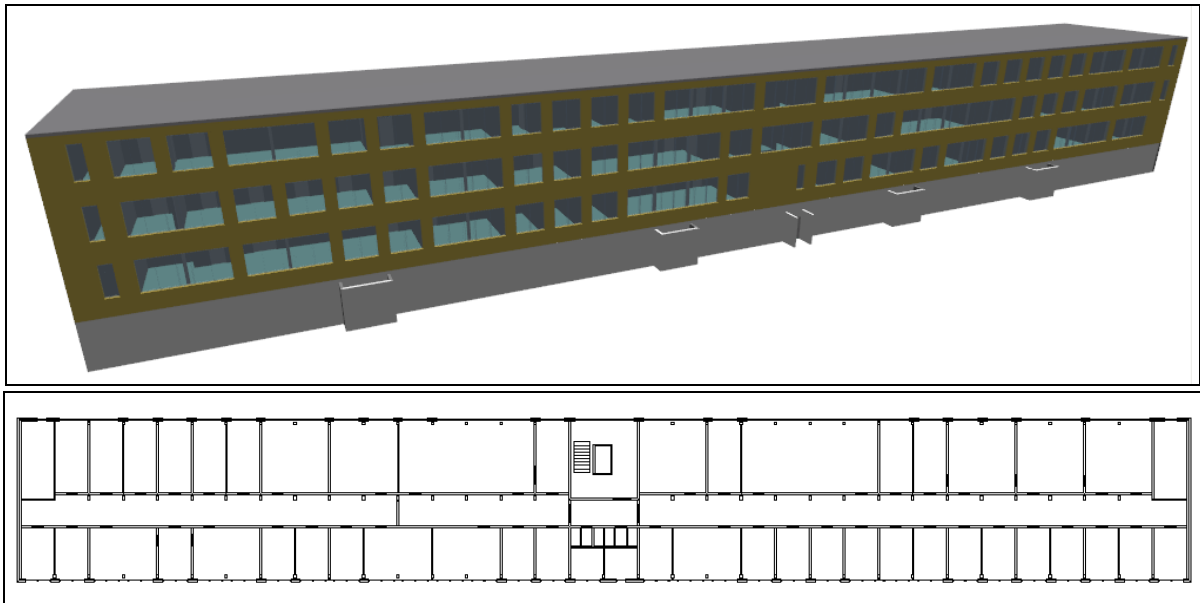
Model of Building 118 at DTU created in AutoCAD Architecture 2008. Plain drawing illustrates the layout on the first floor of the building. North would be upwards on this drawing.
